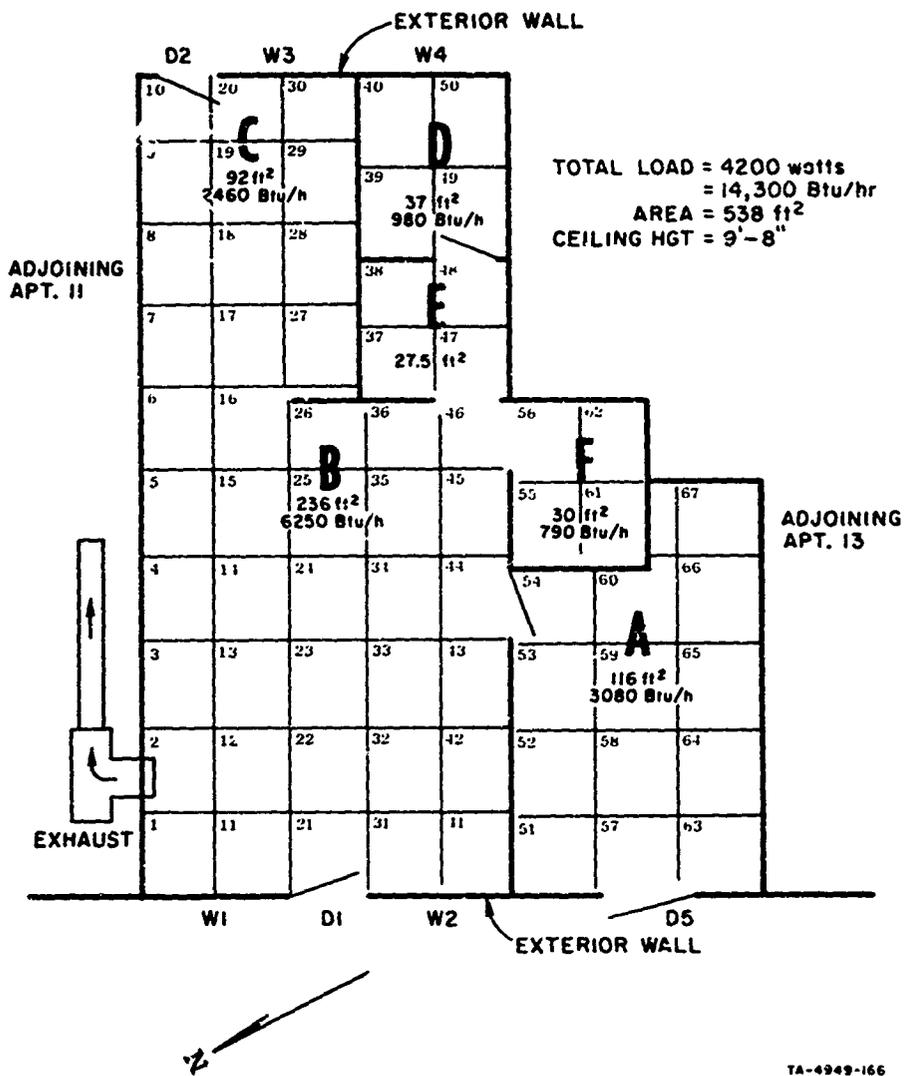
FLOOR PLAN OF APARTMENT 12, BUILDING 204B
